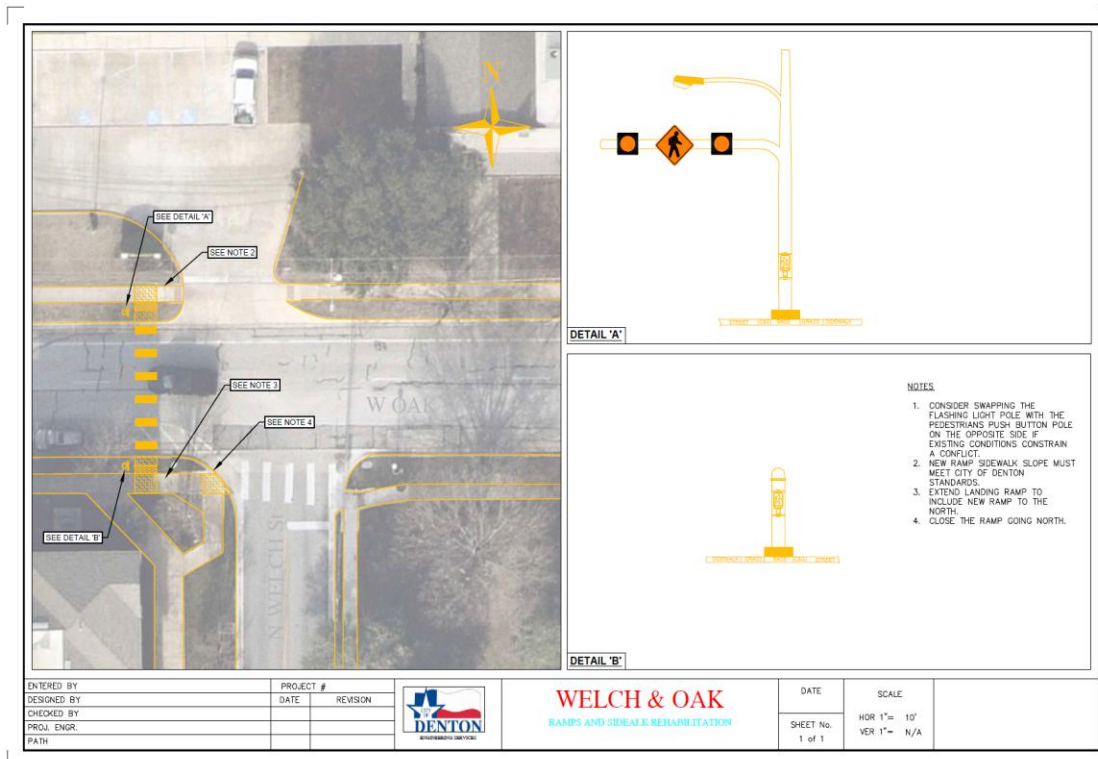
Layout of Road Safety and ADA Improvements on Oak and Welch Street
